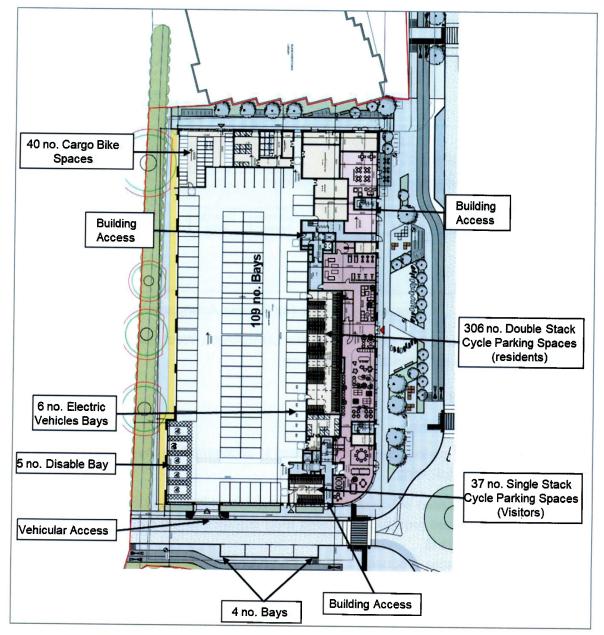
Proposed Car Parking and Cycle Parking Provision (Site B)
